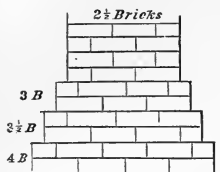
Footings, 1' 10 $\frac{1}{2}$ ''-wall.
